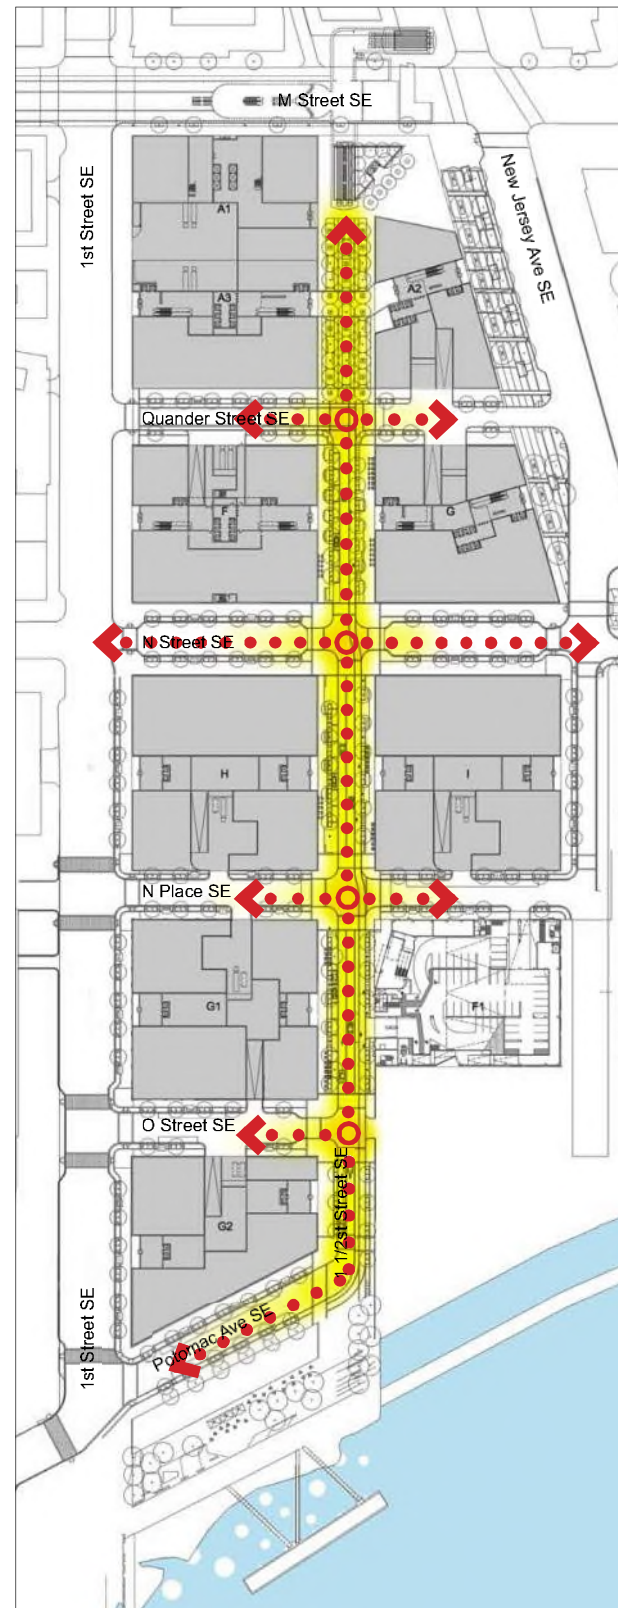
EXHIBIT FROM YARDS WEST MASTER PLAN, PREPARED BY:
